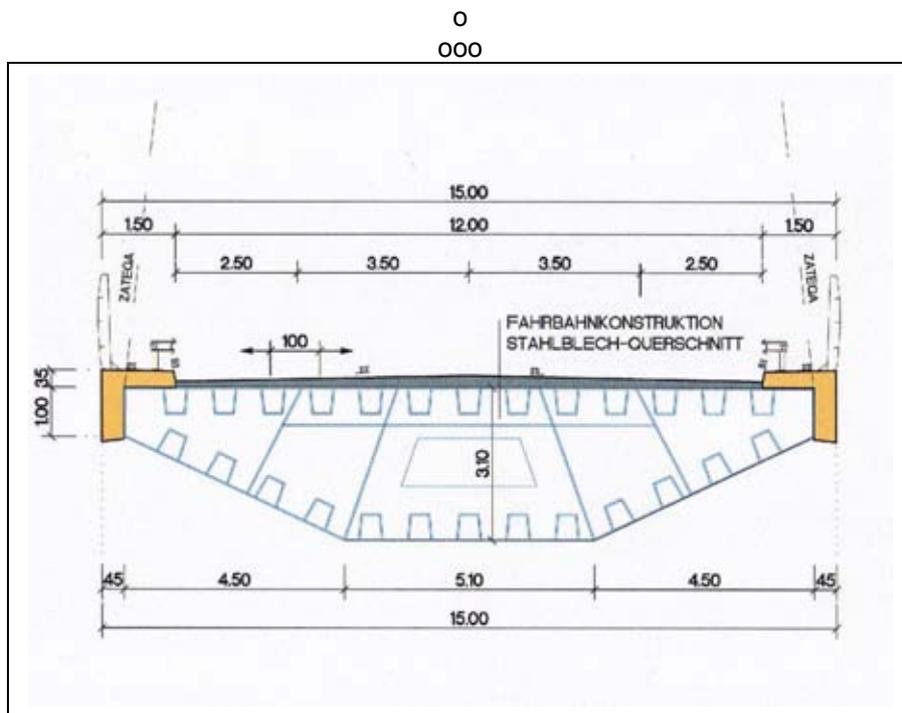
Regular cross section of a cable stayed bridge span of 385.0 m.
